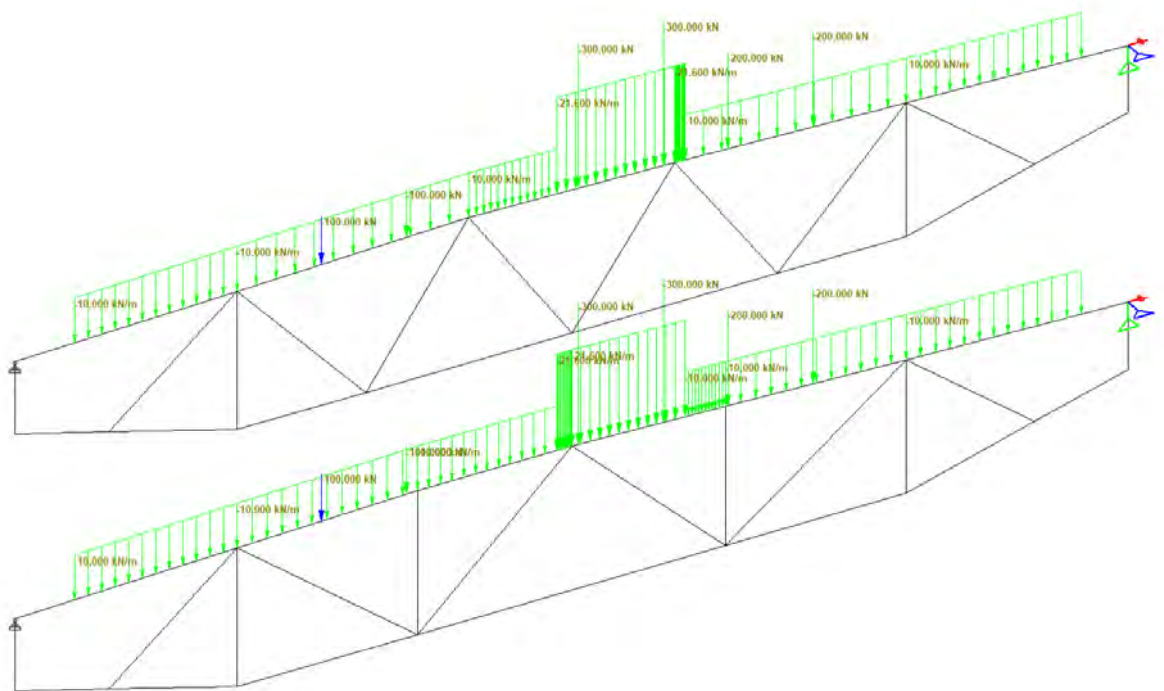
Traffic loads on bridge girder with maximum traffic in lane 3
